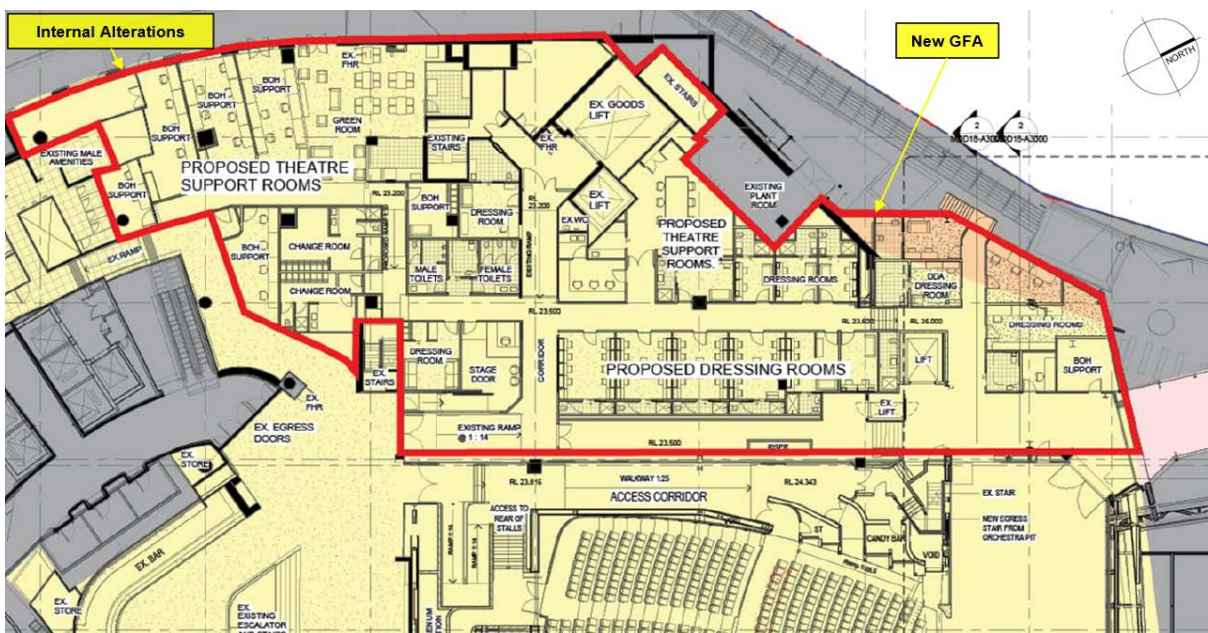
| Proposed internal conversions for dressing room and support space (Source: RTS)
